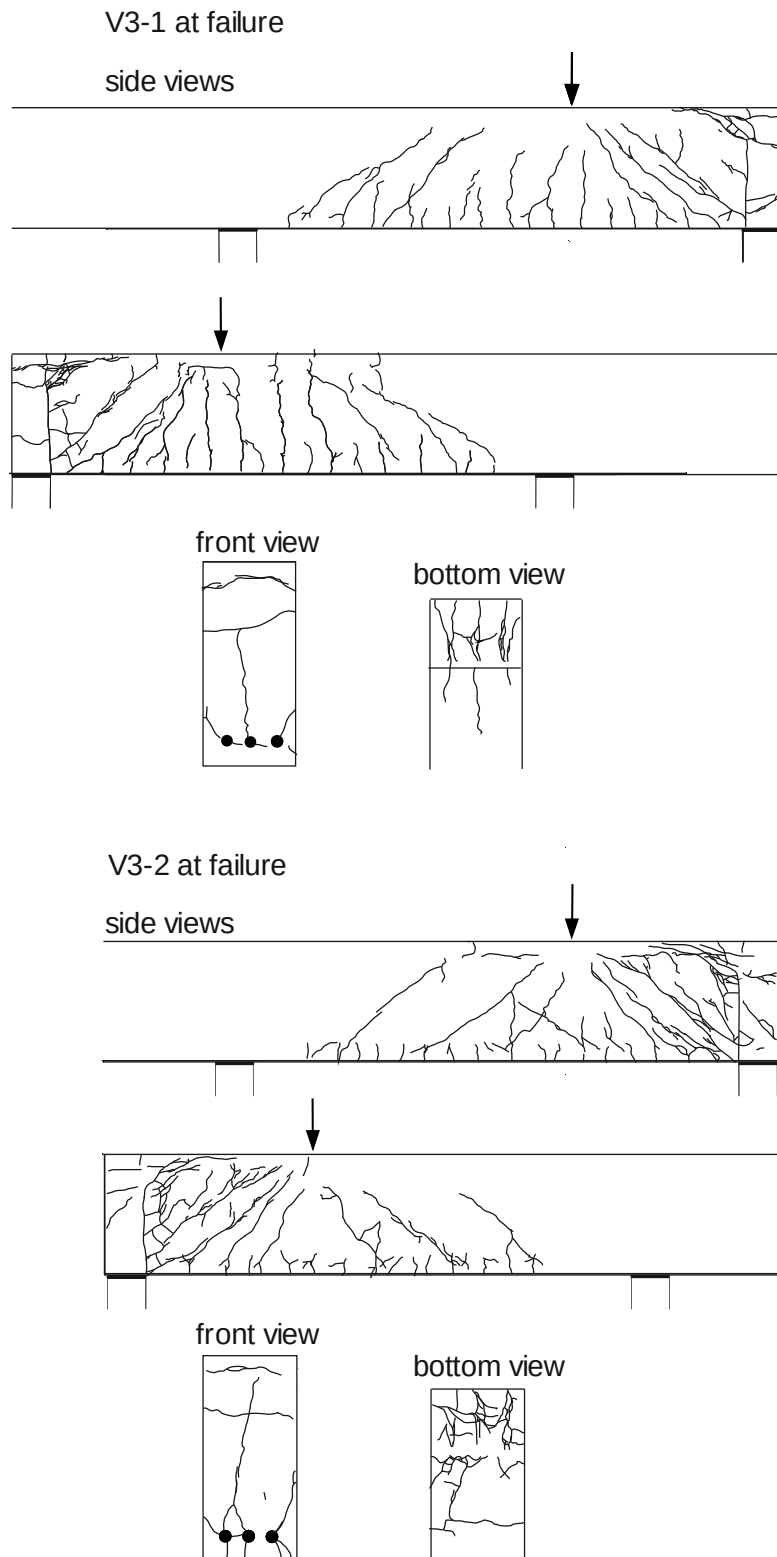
Crack development in anchorage tests V3-1 and V3-2
